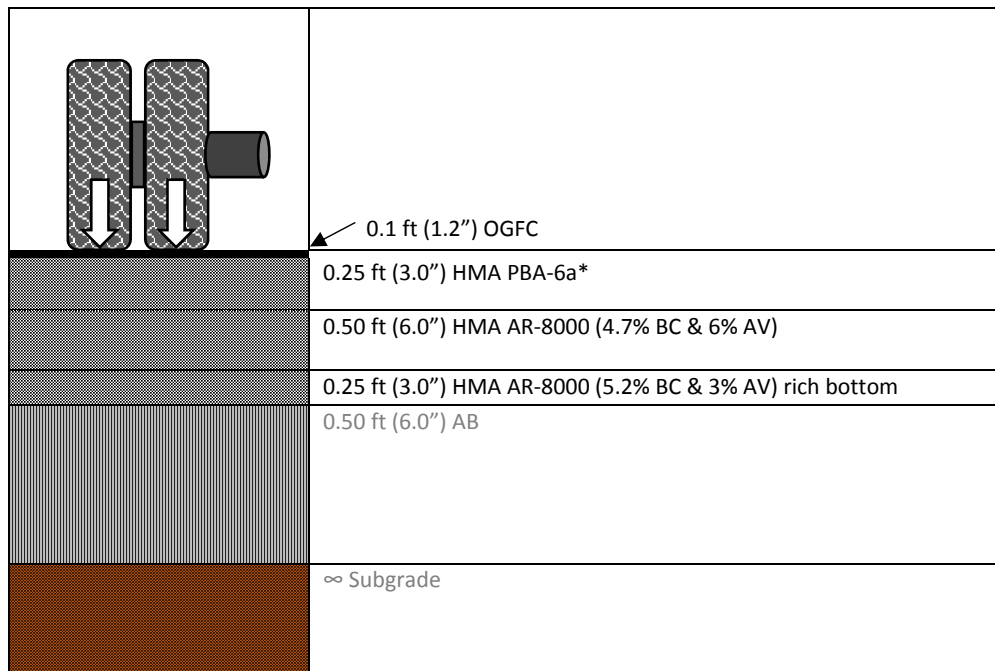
Final structure section for the LA-710 freeway utilizing full depth asphalt concrete strategy at undercrossing locations.
